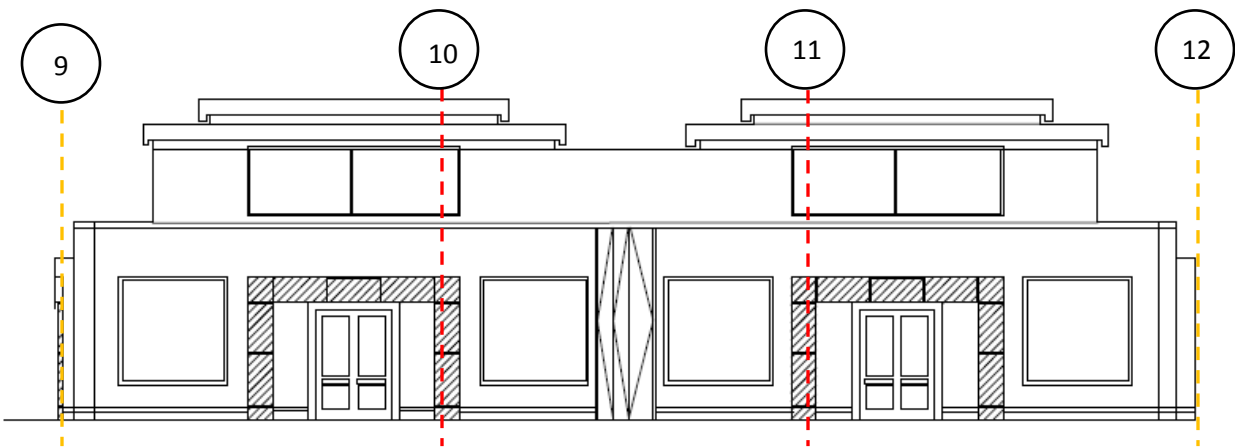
North Elevation of Ballroom | Proposed Location of Clerestories
